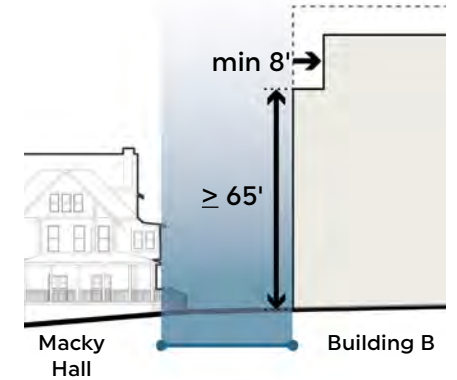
West facade of Building B height reduction and stepback requirement for 85% of elevation
